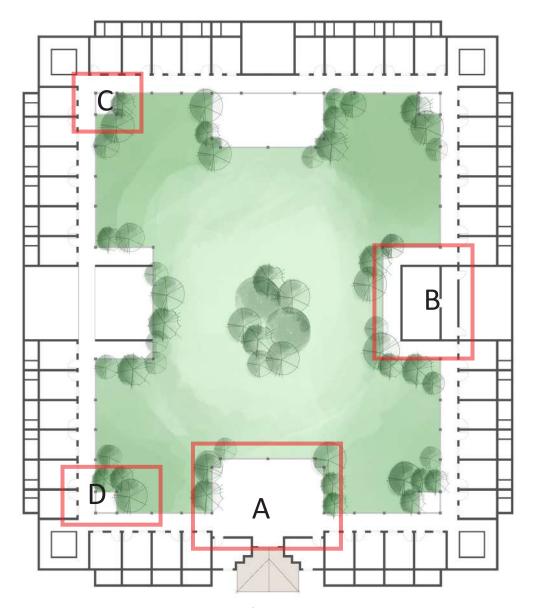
Floor plan showing the identified place attchments spaces Source: Author
